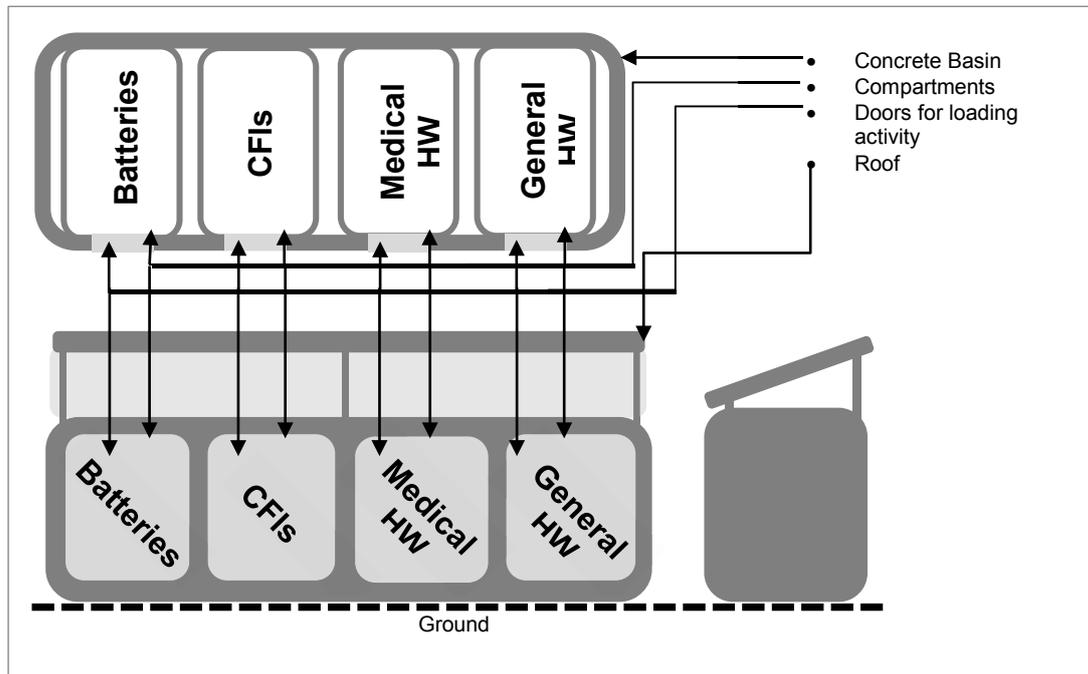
Ground, front and side layout of hazardous waste storage site; (Own figure)
